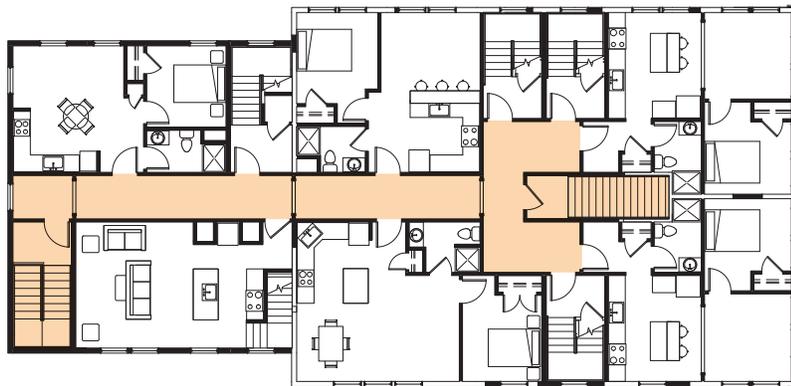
Second floor plan. All residential units are accessed via a shared corridor (highlighted in orange).
